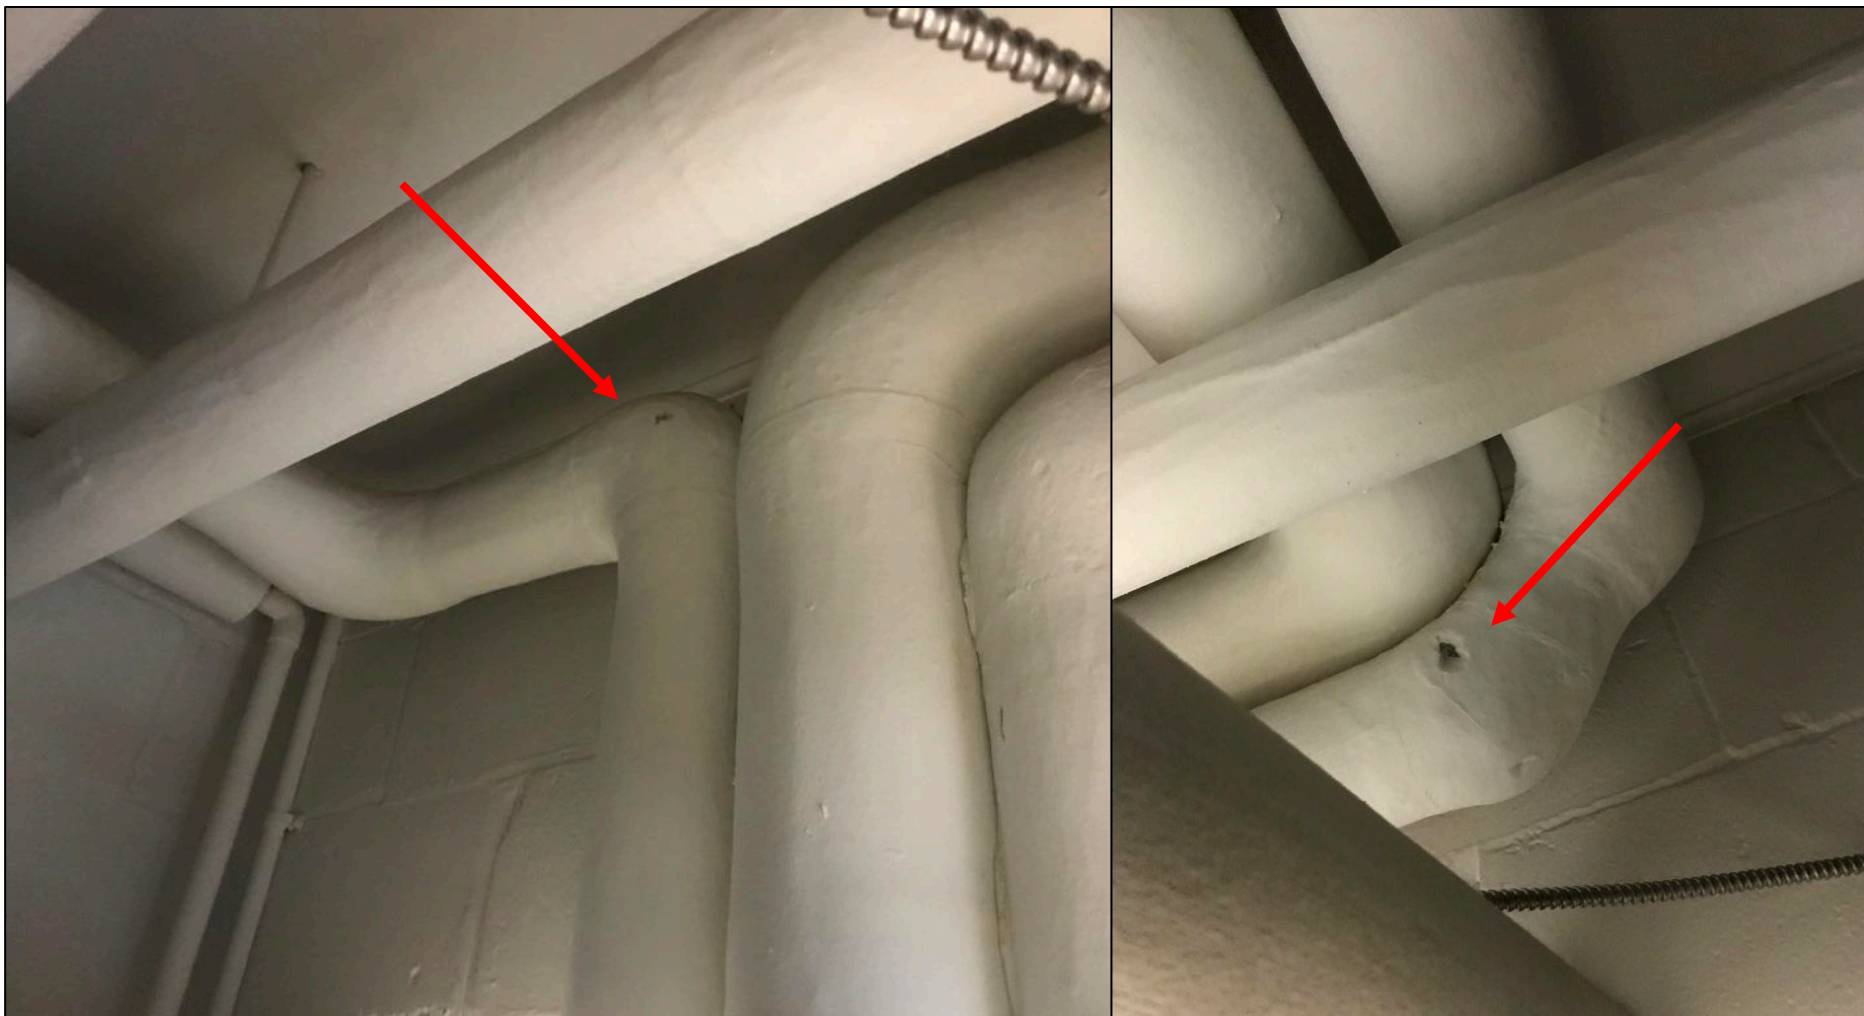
View of fittings in poor condition above ceiling tiles in Room 109.
